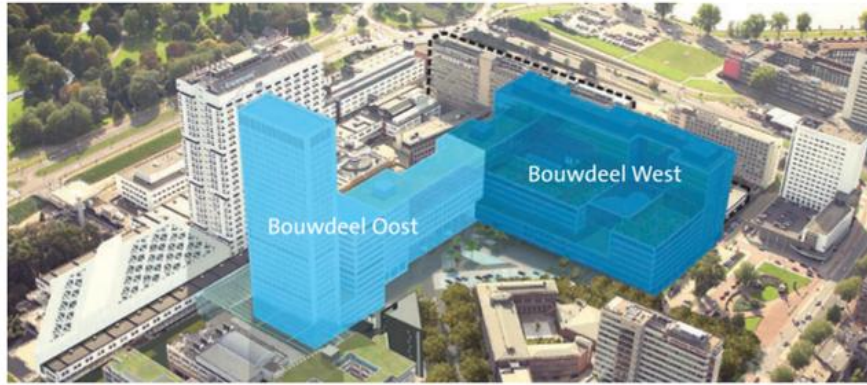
Constructed buildings at Tranche 1 [Nieuwbouw Erasmus MC]
